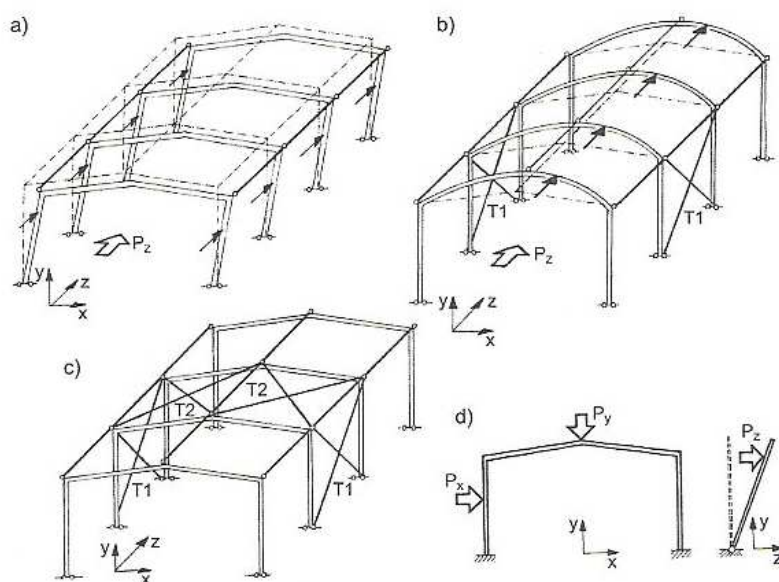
Possible deformations of the a), b) unbraced system, c) braced properly framing
